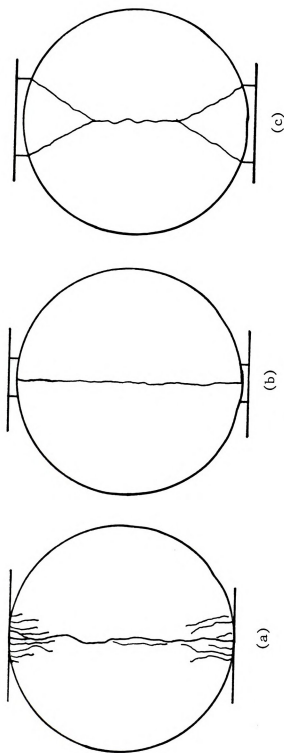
Typical Failure Modes; (a) No Loading Strip, (b) Ideal Loading Strip, (c) Wide Loading Strip (Mitchell, 1961).
